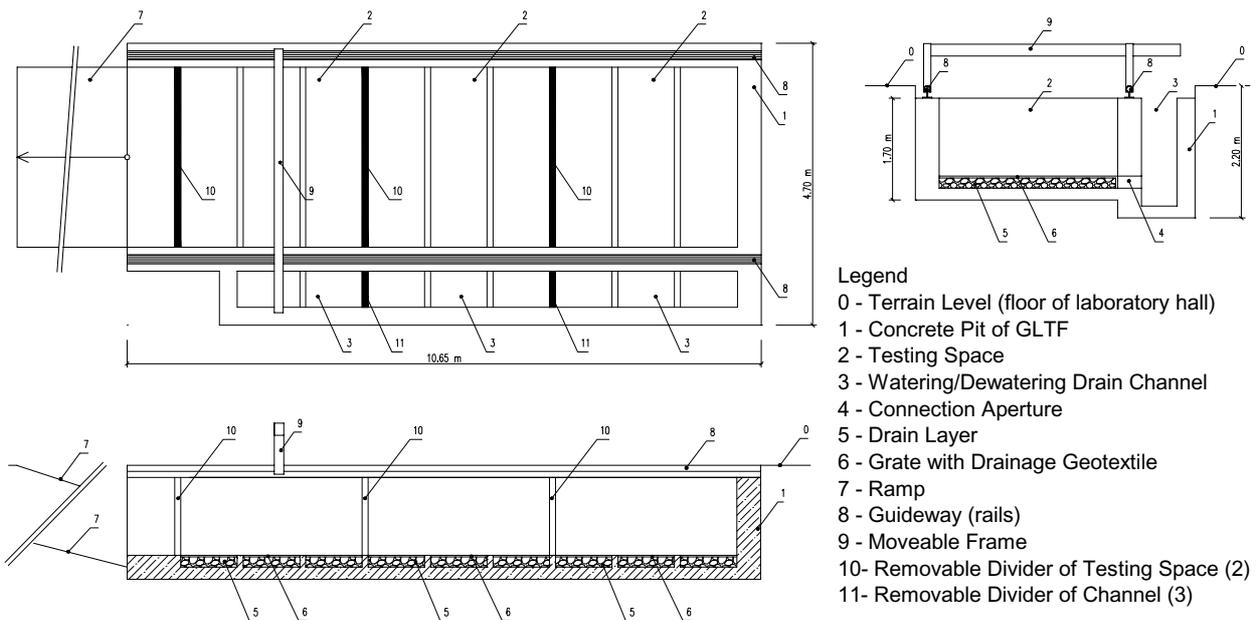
Geotechnical Laboratory Testing Field (GLTF)
